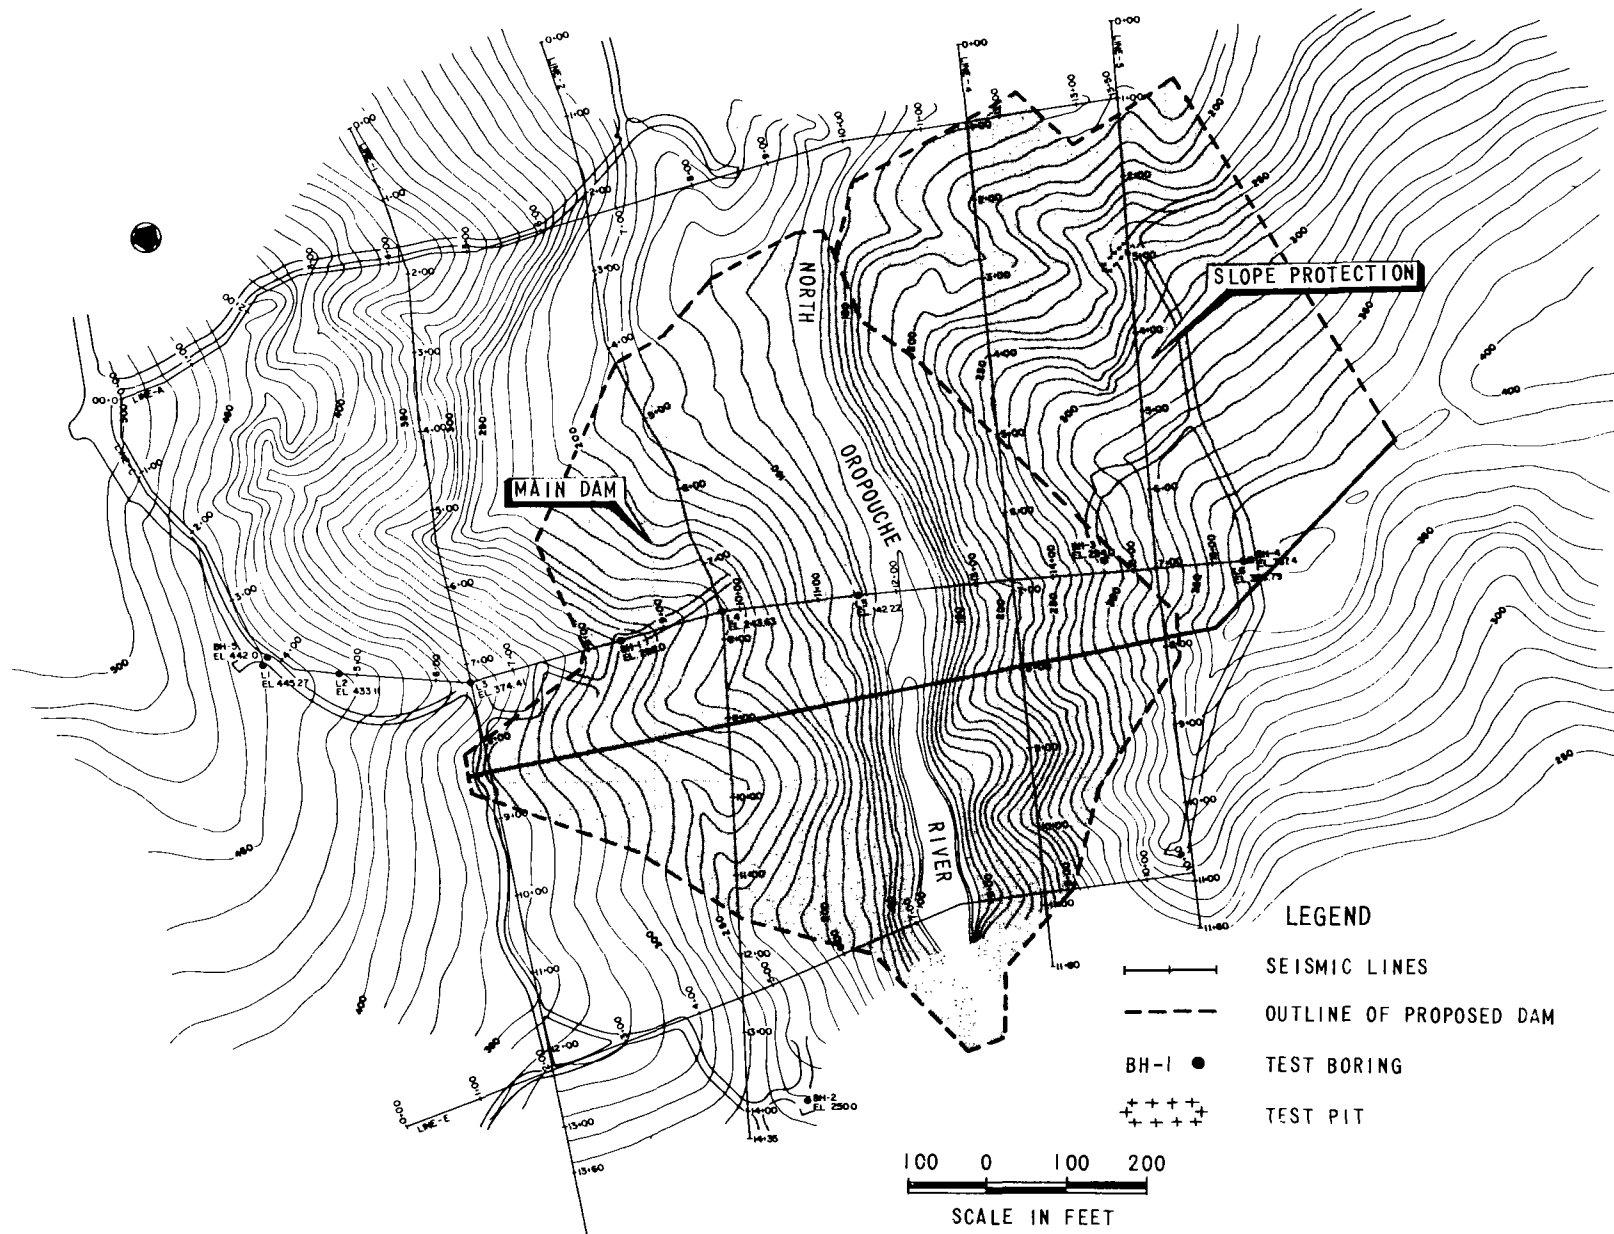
NORTH OROPOUCHE DAM – PLAN OF SUBSURFACE EXPLORATION
